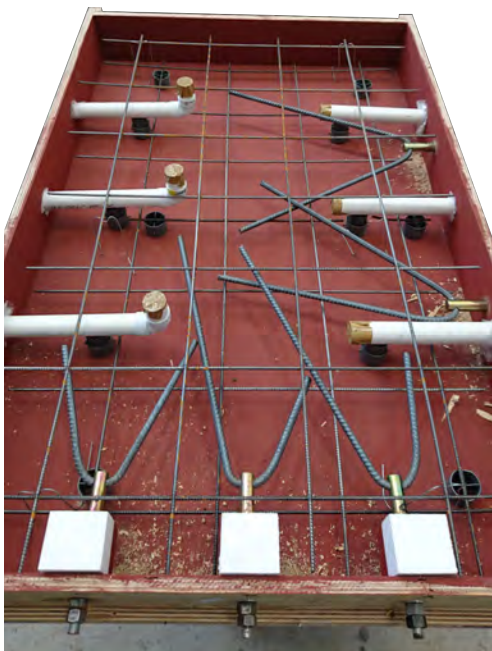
LWFC mould showing 16 mm anchor bolts, 12 mm rebar, 40 mm grout ducts and wooden void spacers
